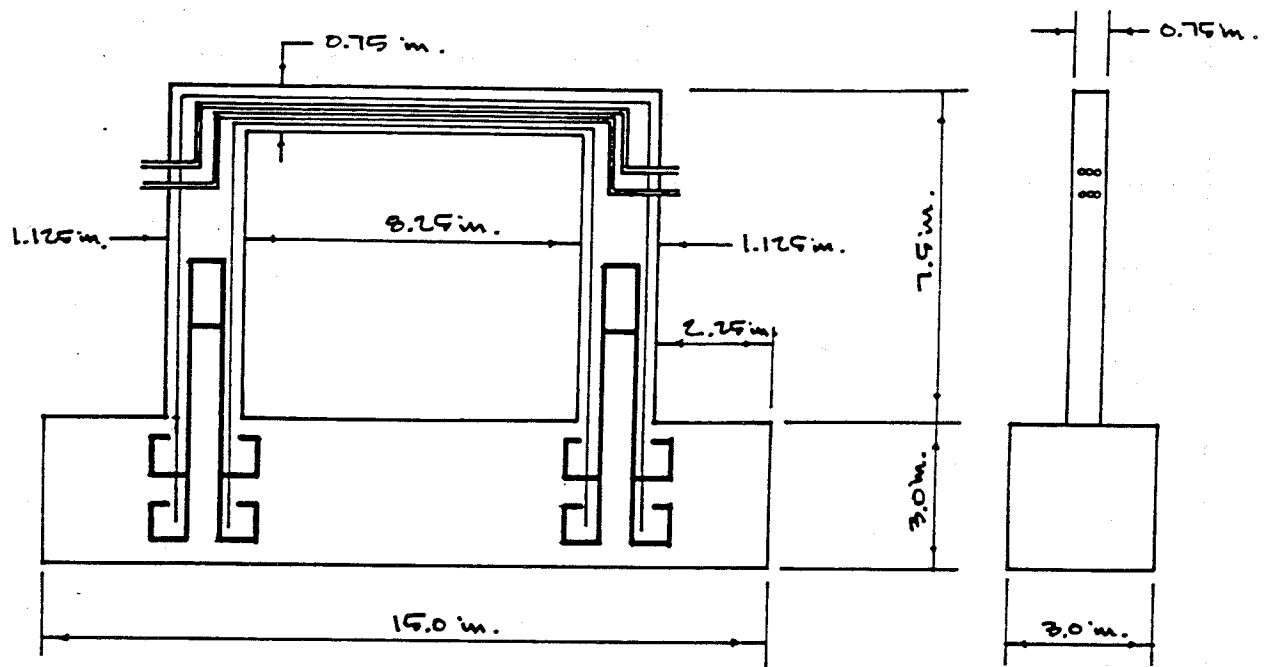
Drawing of sample test frame used in tests 1 and 2.
